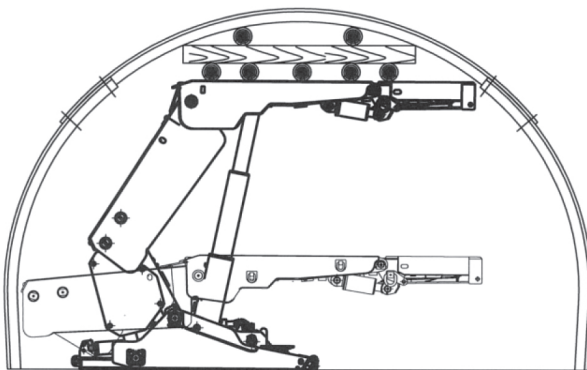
Coupled ŁPK frame with an installed powered support unit (unit before and after spragging)
